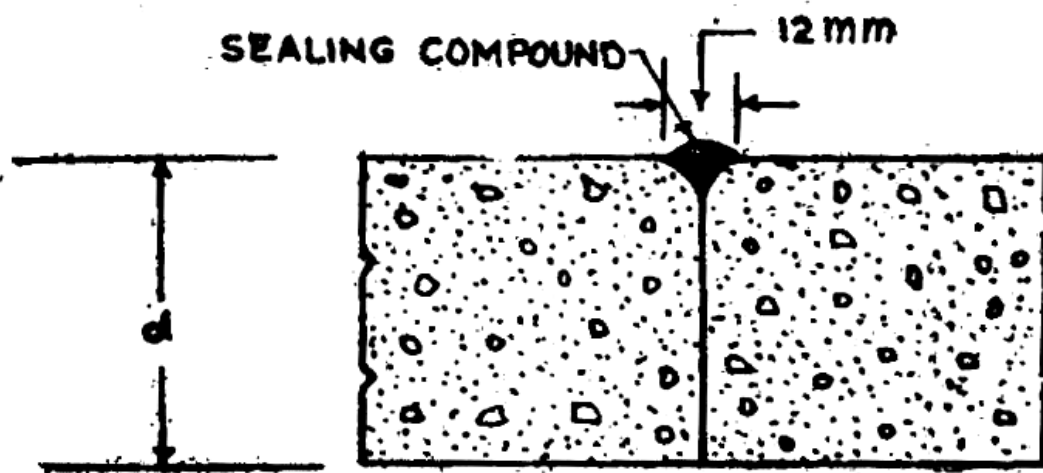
Plain butt joint (for longitudinal Warping and construction joints)
